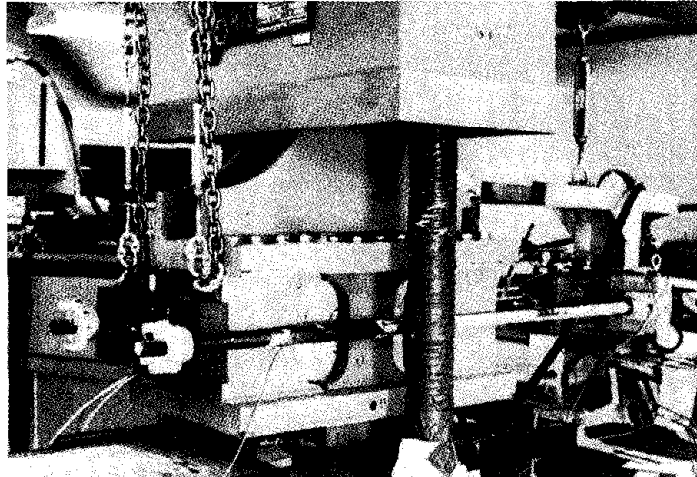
Cyclic Triplet - Test Fixture and Specimen in MTS Machine
